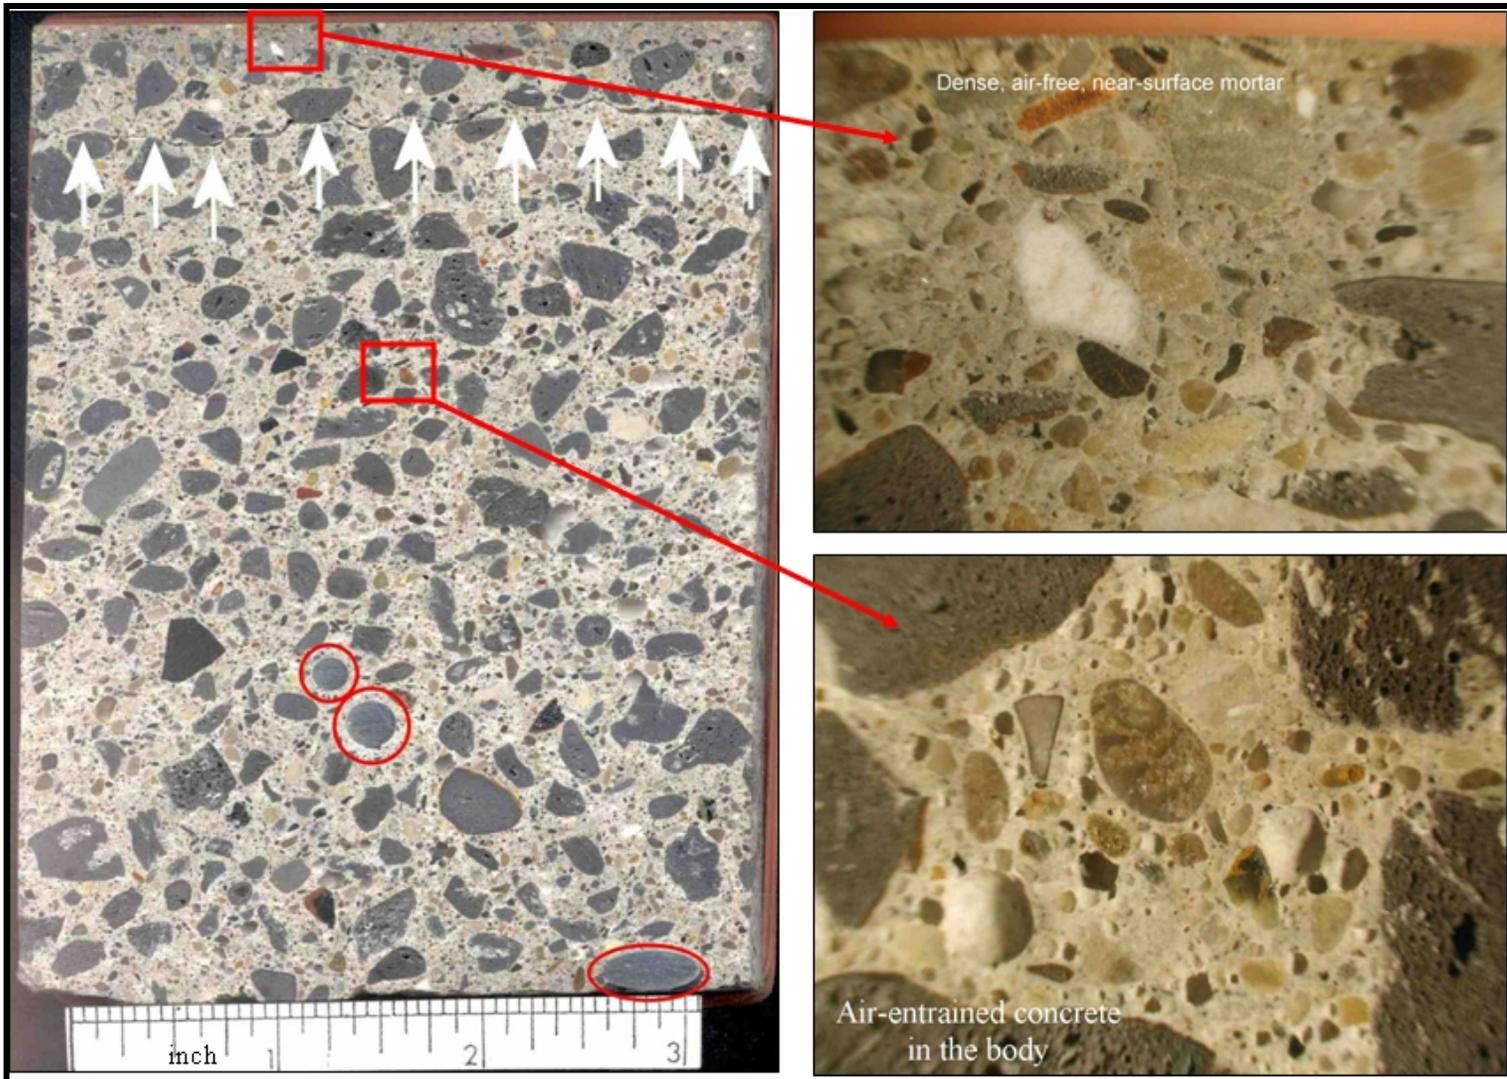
(Delamination in a lightweight aggregate concrete slab that has received a hard trowel finish): Cross-section of a concrete core from a delaminated lightweight aggregate concrete slab showing the delamination (white arrows in the left photo) and contrasting features of the dense, low-air, near-surface region and the less dense, air-entrained interior concrete. The right photos are the enlarged views of the boxed areas in the left photo, taken by using a stereomicroscope (field widths of right photos are 20 mm). Within the circles and ellipse in the left photo are wire meshes in the concrete.
